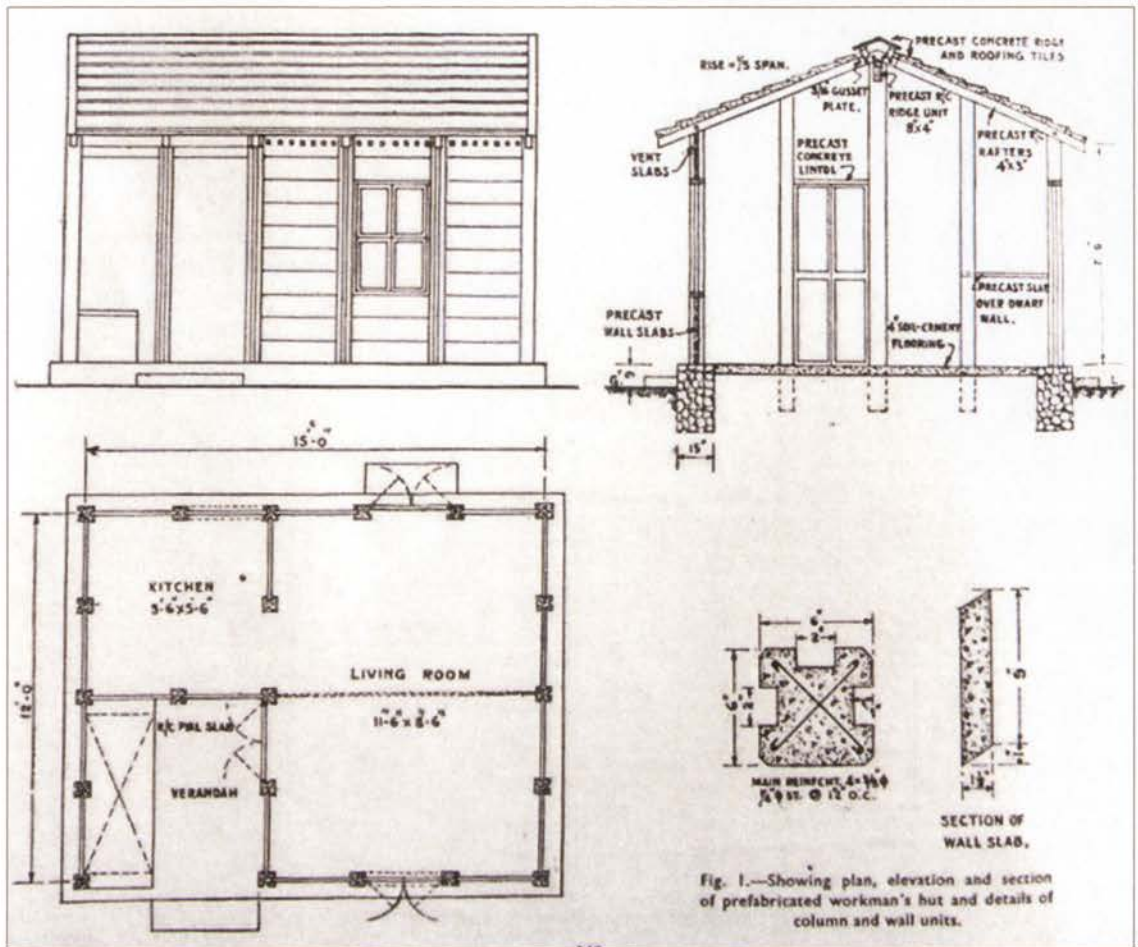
Showing plan, elevation and section of prefabricated workman's hut and details of column and wall units.
